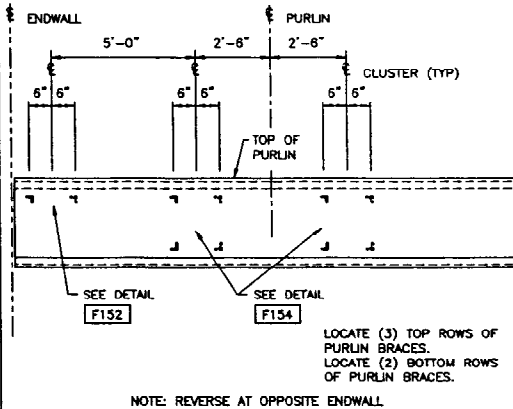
CONTINUOUS SPAN PURLIN CONNECTION END BAY LOCATION - 9-1/2" PURLIN
